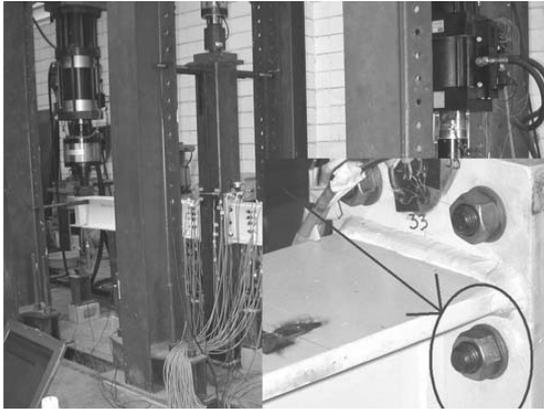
Typical failure mode for C1 and C2 through-bolt details
